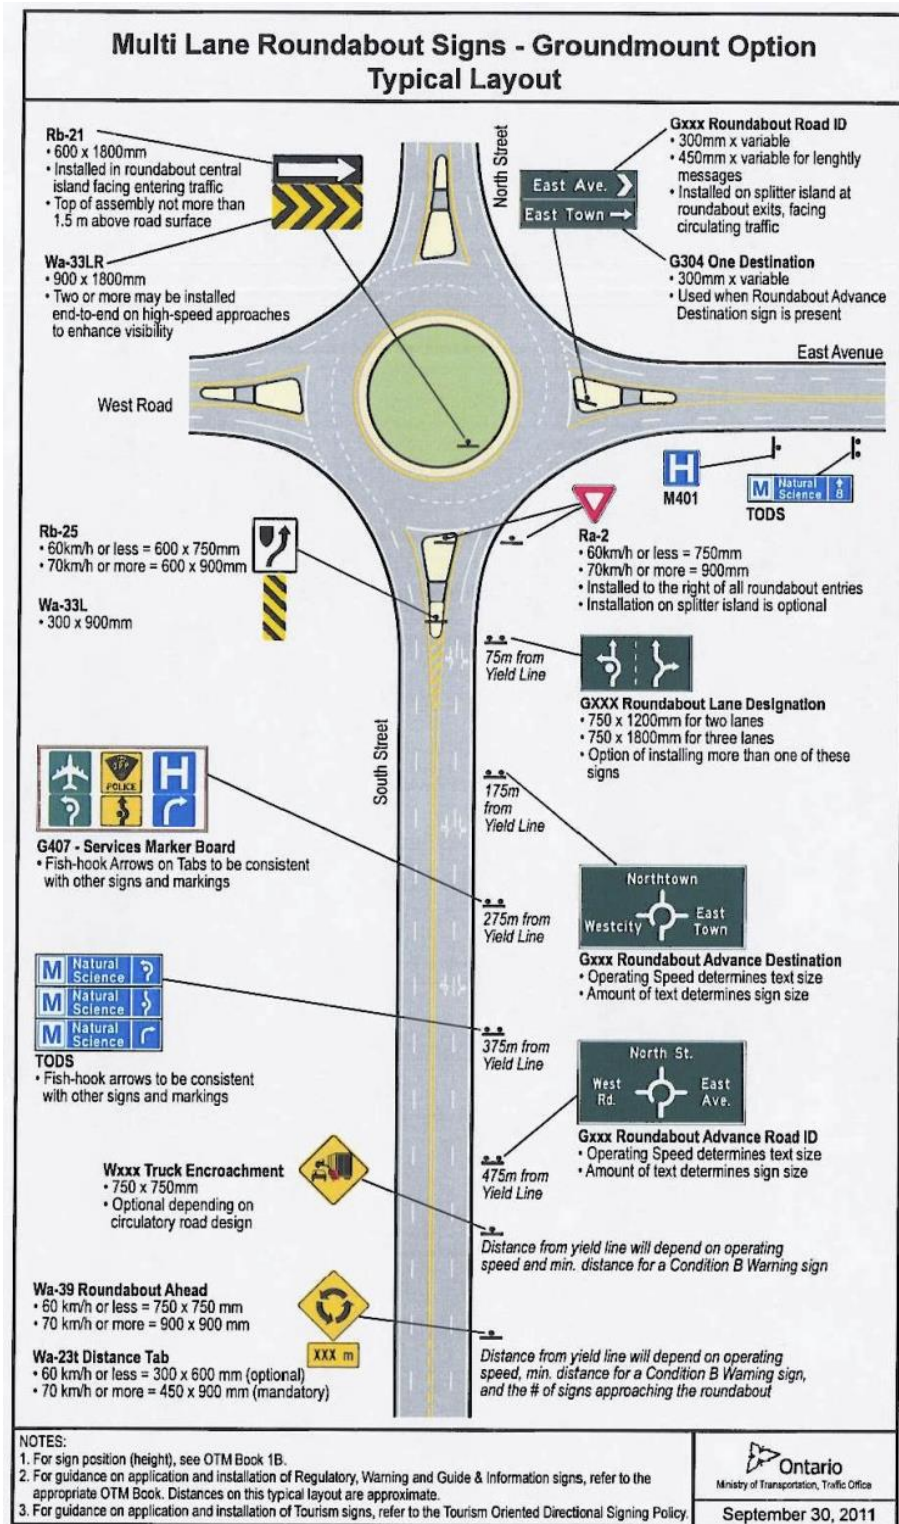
Typical Signage on a Multilane Roundabout (Source: MTO)
